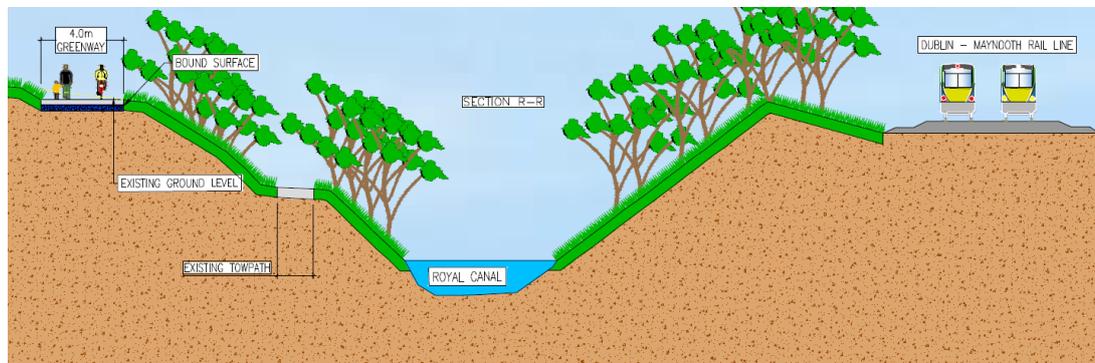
Cross-section of the proposed greenway route through the Old School house Lands.
